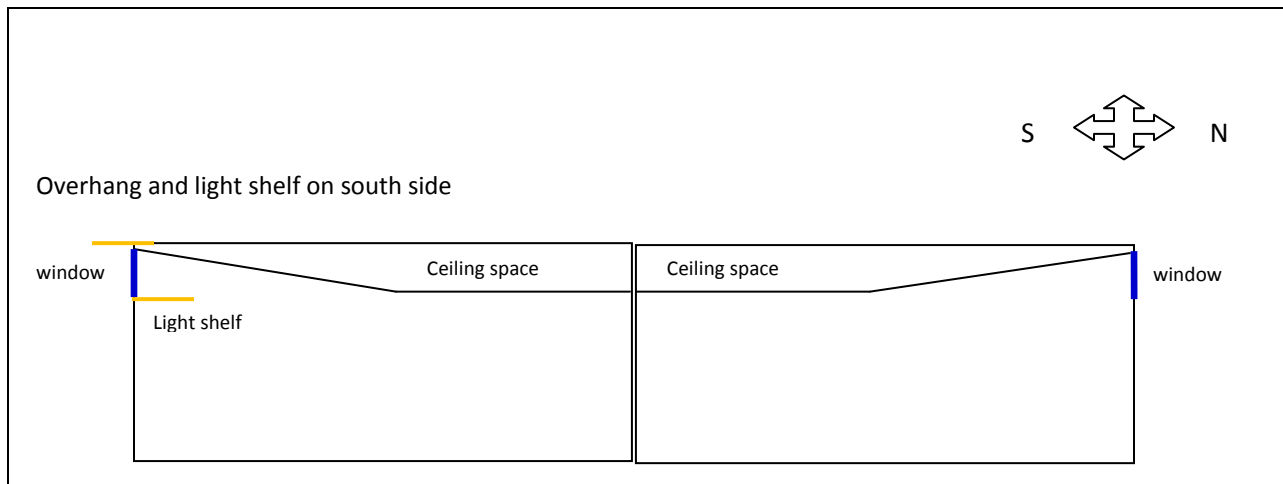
Windows built into upper wall with tapered ceiling space. Windows in upper section reduce glare and open up wall area for other uses. South, East and West exposures need shading device and benefit from light shelves.
